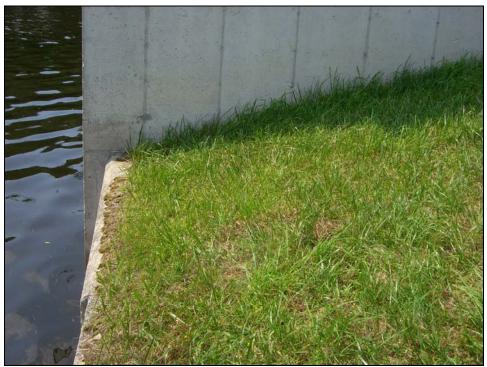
The upstream wave wall and gatehouse foundation to the right of the primary spillway. Minor outward wave wall movement was observed in this area.
